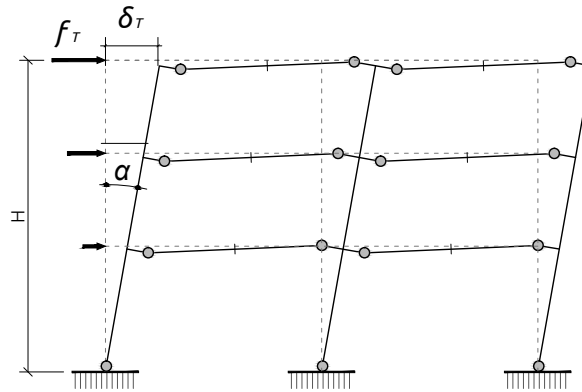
Weak beam strong column failure mechanism
